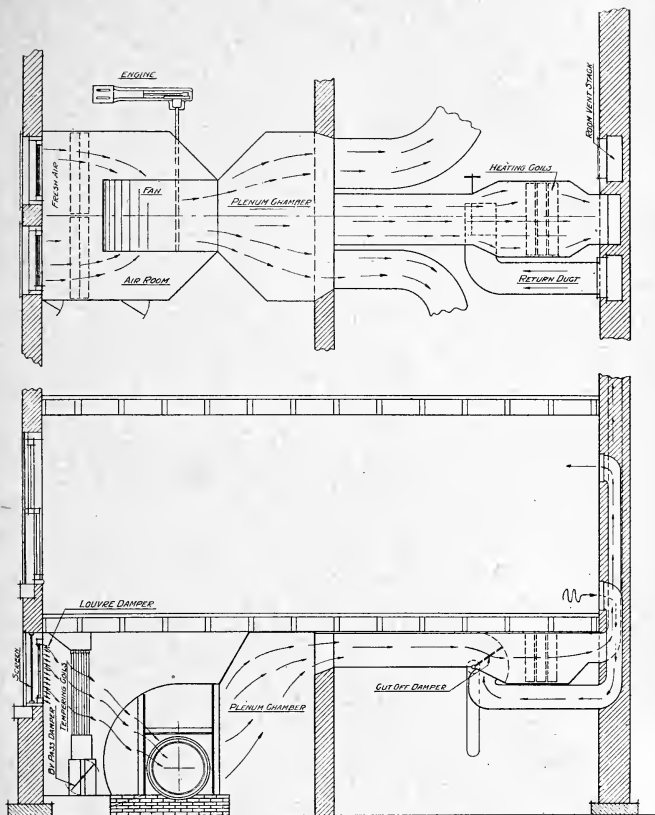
Fan Room Layout with Heating Coils Divided into Individual Room Heaters.
